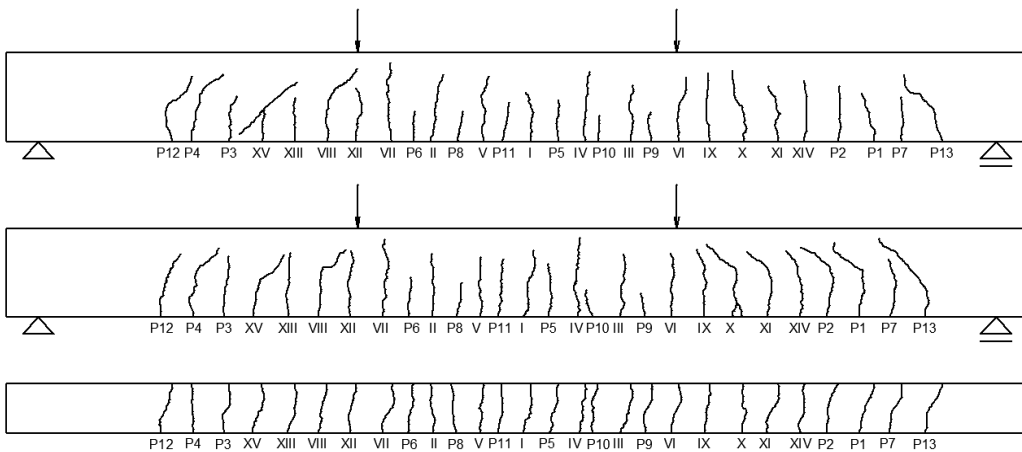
Scheme of cracks location on the bottom and both side surfaces of beam B1
